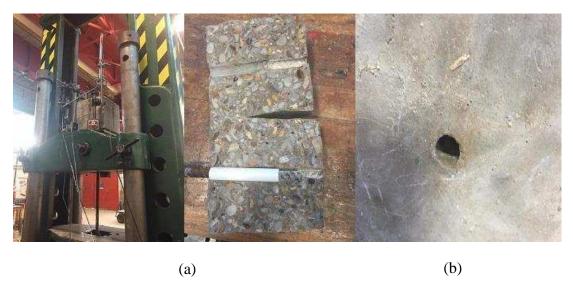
Failure mode through pull-out test a) bonded samples, b) unbonded samples
